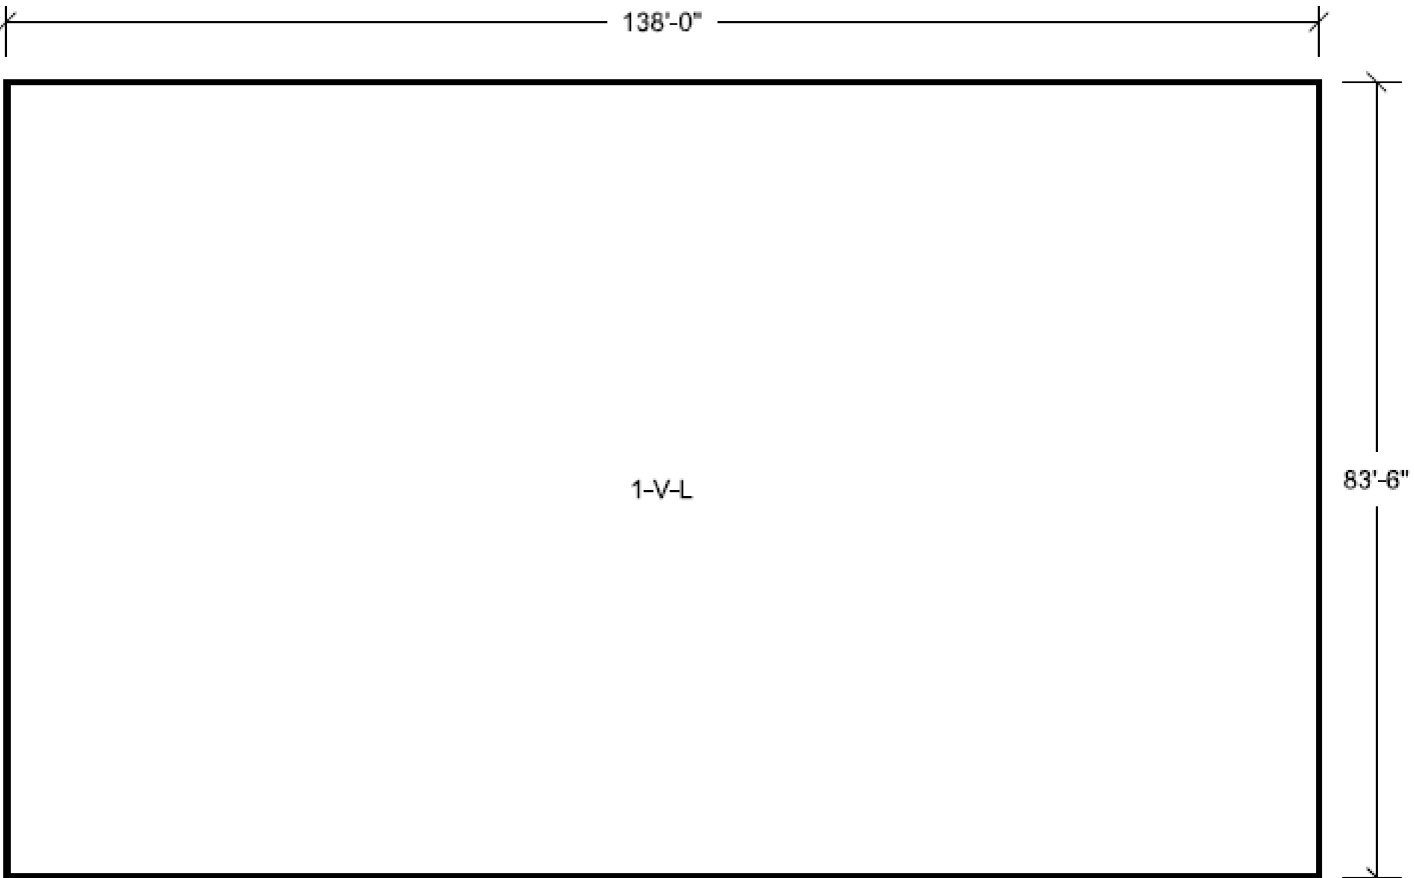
H.6-93 UHS Basin East Wall Looking West Vertical Reinforcement Zones Near Side Face
